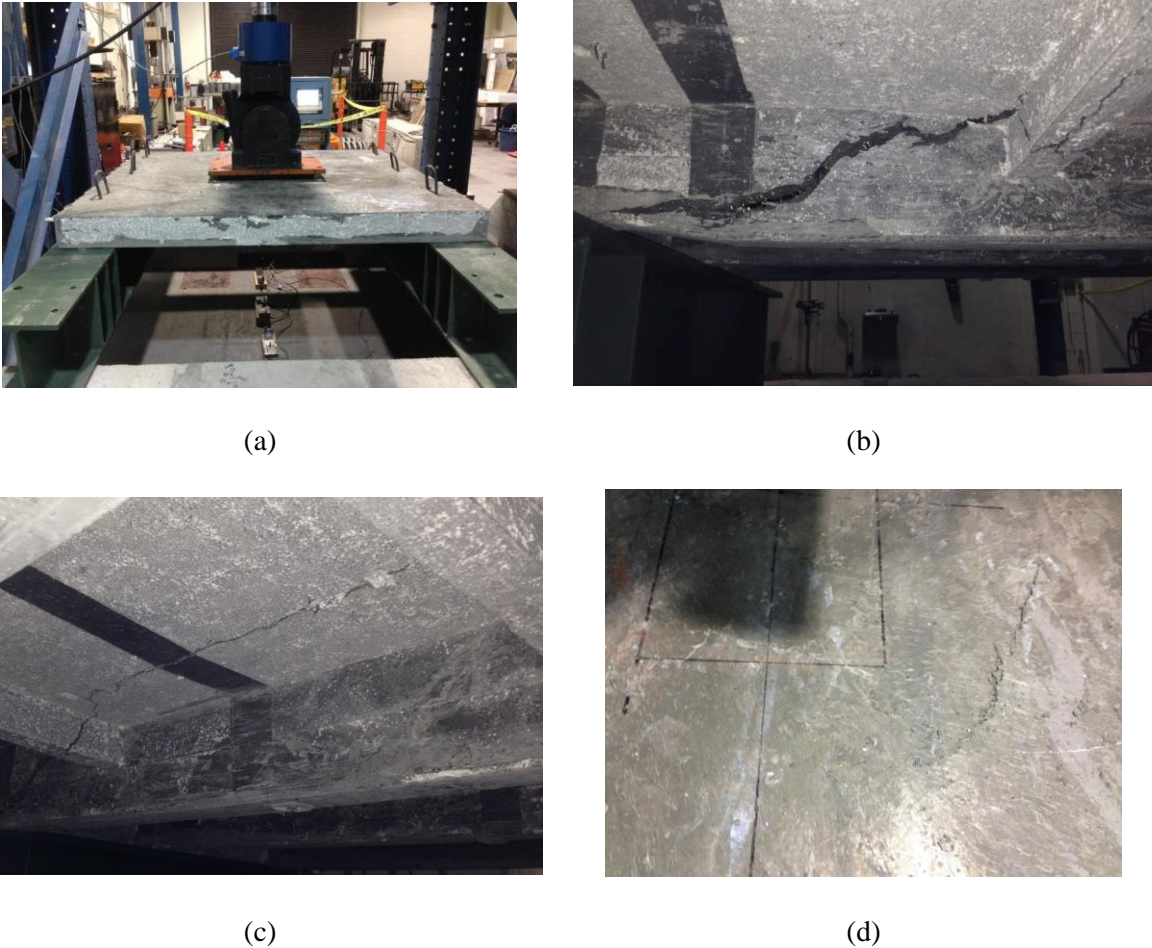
Flexure Test and Failure Mode of Specimens 4T1S-HSS, (a) Test Setup, (b) Beam Shear Crack, (c) Cracks on the Slab, and (d) Cracks on the Top Slab
